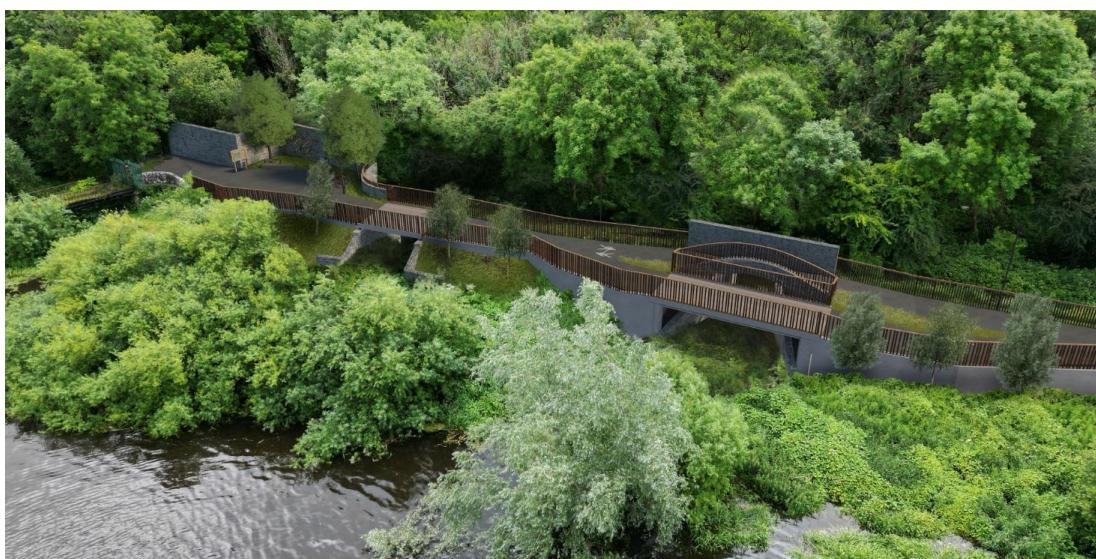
Proposed bridges No 2 & 3 and rest area east of Plassey Mills
